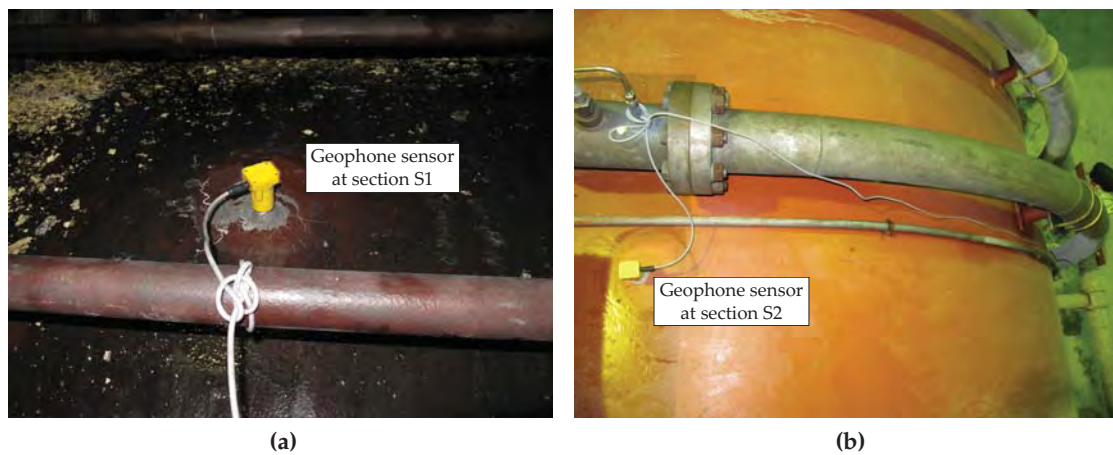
Geophone sensors fixed on the exterior face of the steel-liner of the Grimsel II shaft, (a) at measurement section S1, (b) at measurement section S2.
